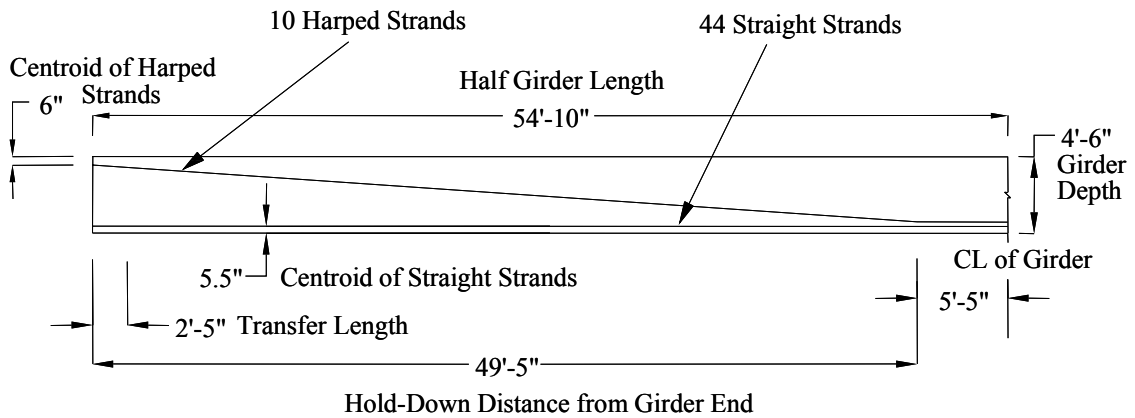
Longitudinal Strand Profile (half of the girder length is shown).
